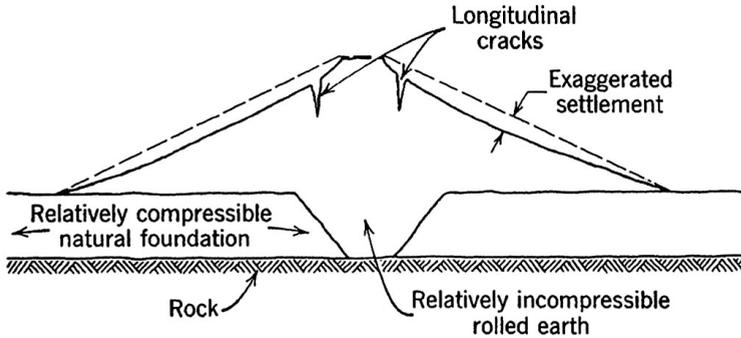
Longitudinal differential settlement cracks over foundation discontinuities (Sherard *et al.*, 1963).
